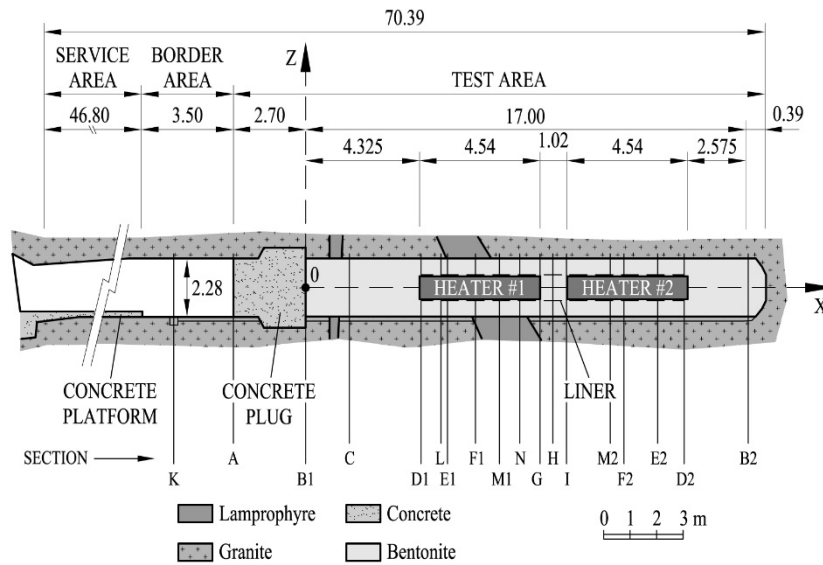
General layout of the FEBEX test. The bentonite instrumented sections are indicated
